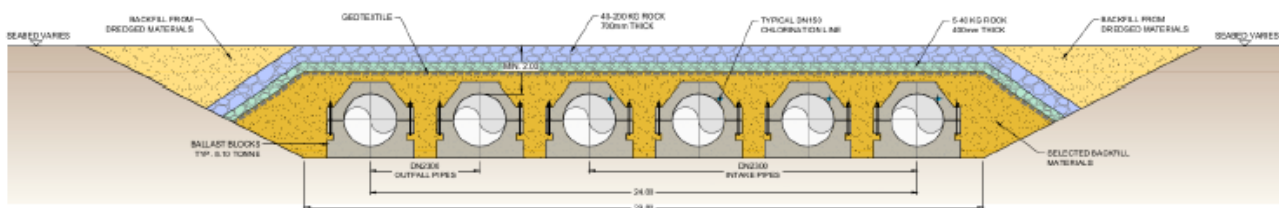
Shallow Area of the Pipeline Corridor - Typical Example Cross-Section with Intake/Outfall Pipelines Having Common Invert Elevation Laid in A Common Trench (Source: Dar/HR Wallingford, 2021)
